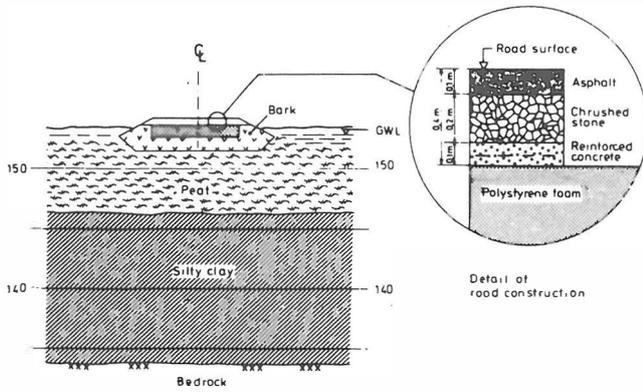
Cross-section profile of road embankment, Solbotmoan.
